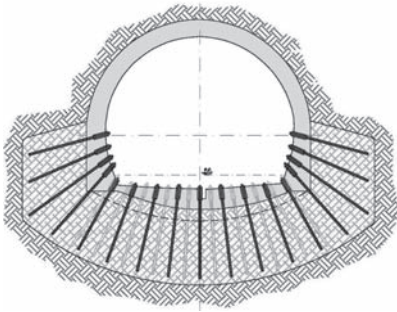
Freeze pipes lay out in the tunnel cross-section.
